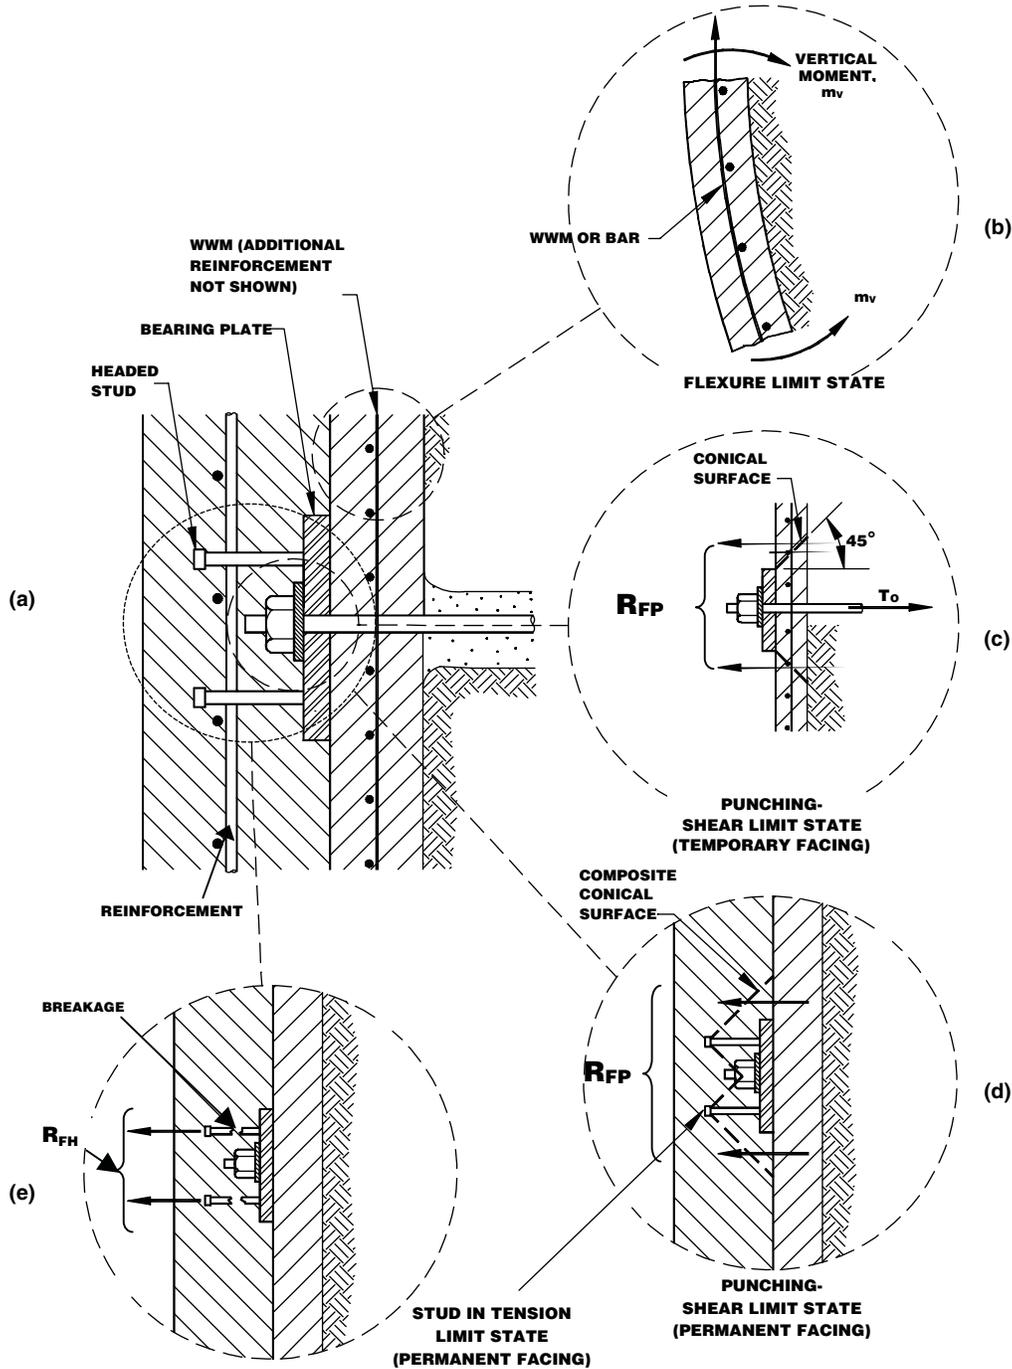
Limit States in Soil Nail Wall Facings: (a) Typical Section; (b) Flexure; (c) Punching-Shear in Temporary Facing; (d) Punching-Shear in Permanent Facing; and (e) Headed-Stud in Tension
